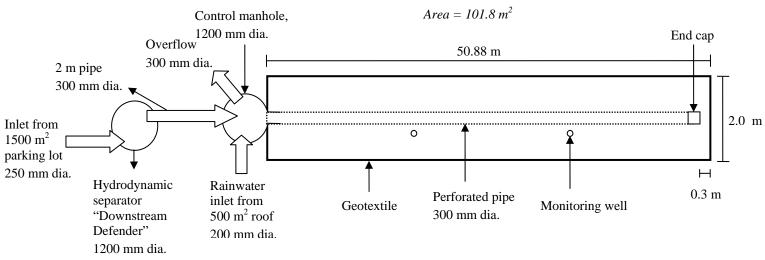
Plan view of the infiltration trench receiving road (1500 m²) and roof runoff (500 m²)
